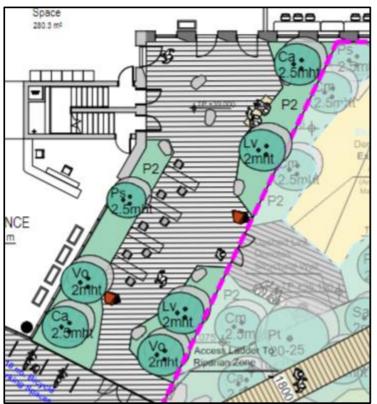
Landscape Plan of the External Amenity Space at Ground Floor Level
